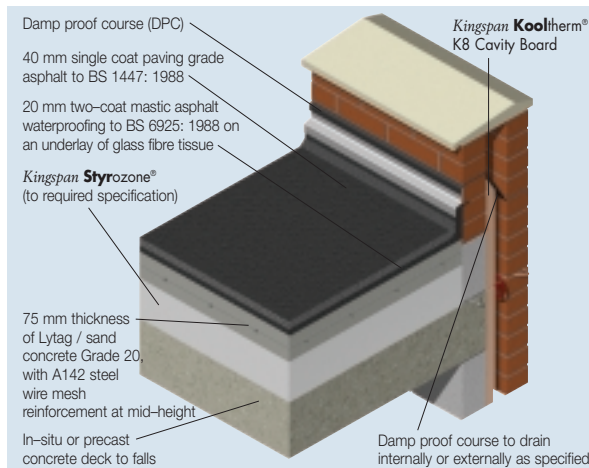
Concrete Slab Finish Loading Bays and Service Decks Commercial Vehicles (Design Should be Verified as to Suitability for Specific Wheel Loads)
